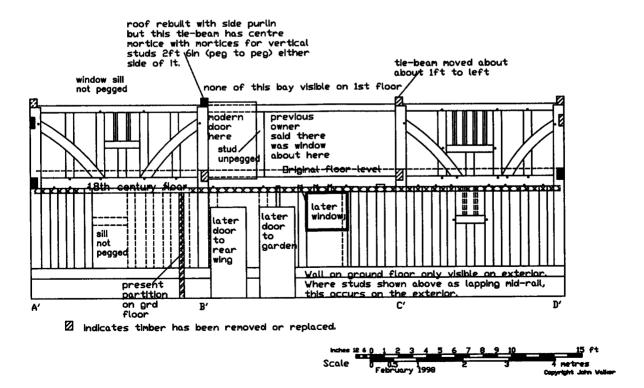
Nazeing, Netherkidders, a reconstruction of the timber frame with an elevation of the rear or east wall.
